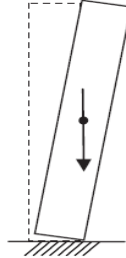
Rocking at base due to insufficient confinement of masonry infill wall
